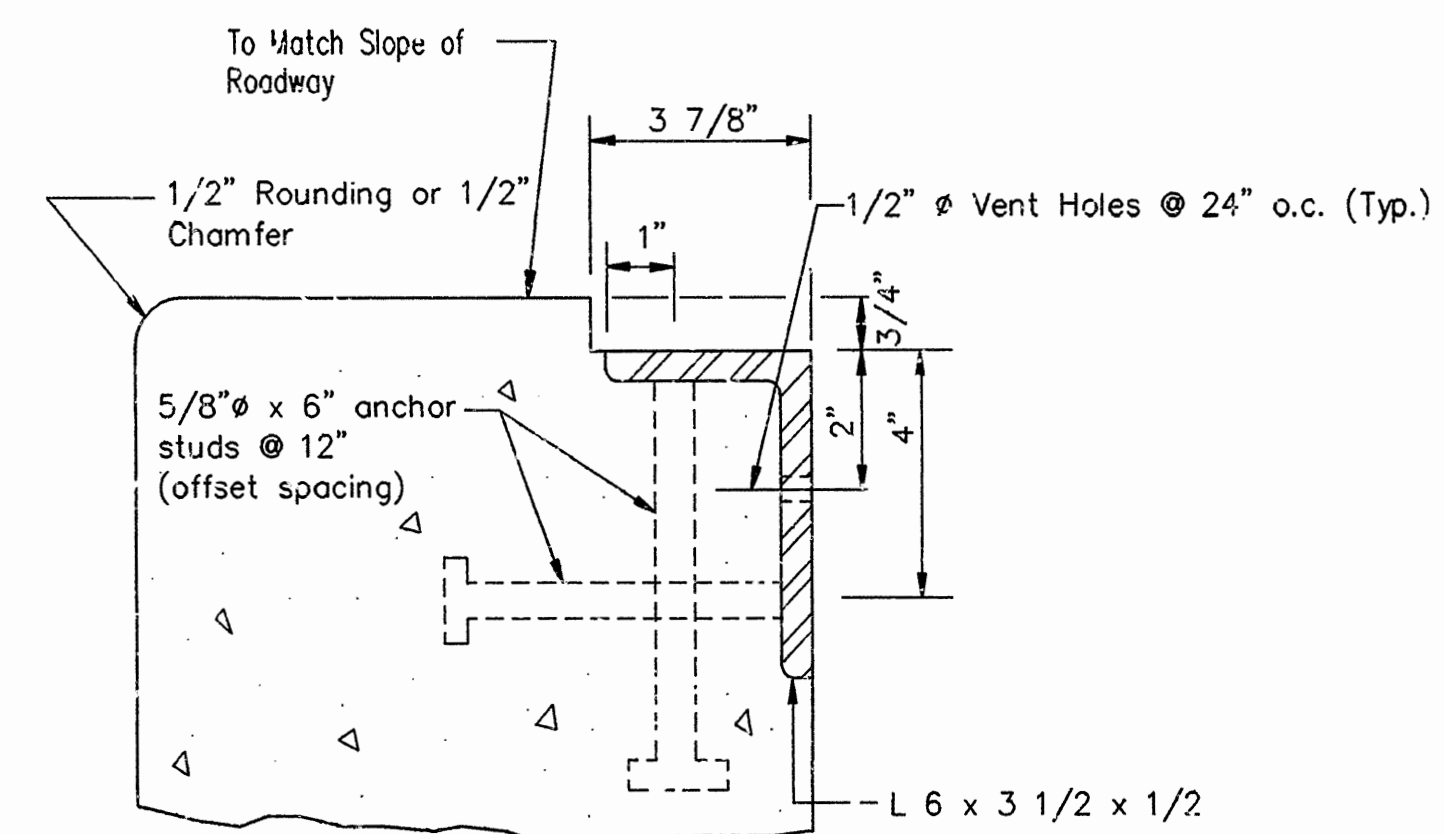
DETAILS OF SLIDING PLATE AT ABUTMENT
